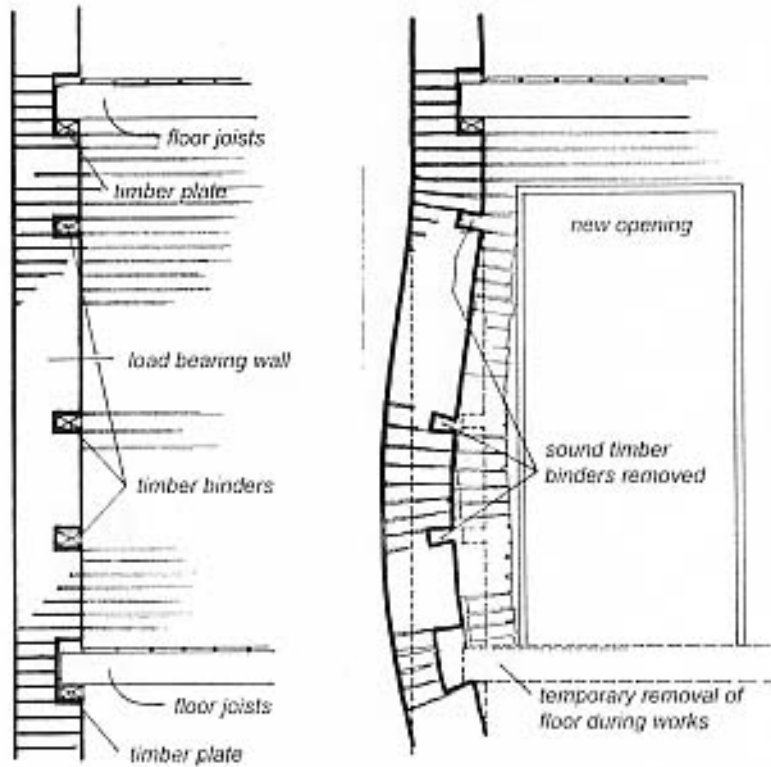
The in-built timber plates and binders naturally reduce the strength of the inner side of load bearing wall. Consequently, the wall tends to bulge outwards but well bonded cross walls, any cross-ties and floors normally restrain this. The removal or weakening of one or more of these restraining elements will allow the wall to bulge. In this example, the new door (right) has weakened the restraining effect of the cross wall; in other cases, the removal of the floor, sound timber binders or ties, can have the same effect.
